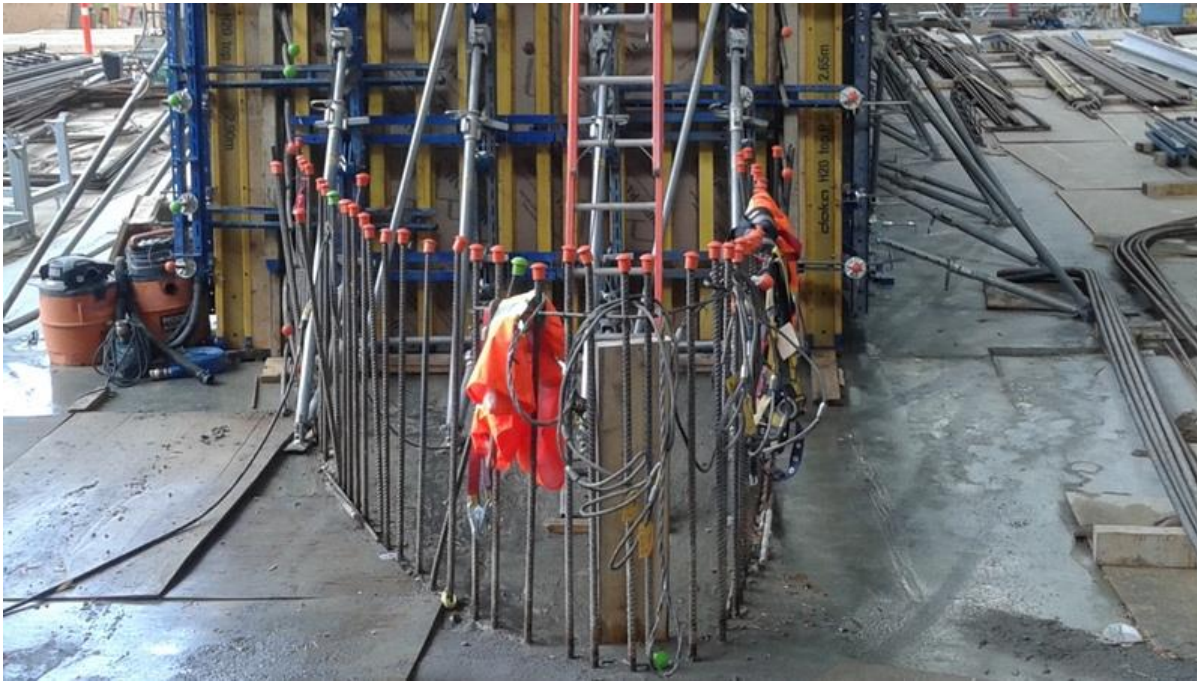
Unit 1 – Invert slab of draft tube completed. Upstream end of draft tube central pier ready for formwork and reinforcement erection (July 7, 2015).
